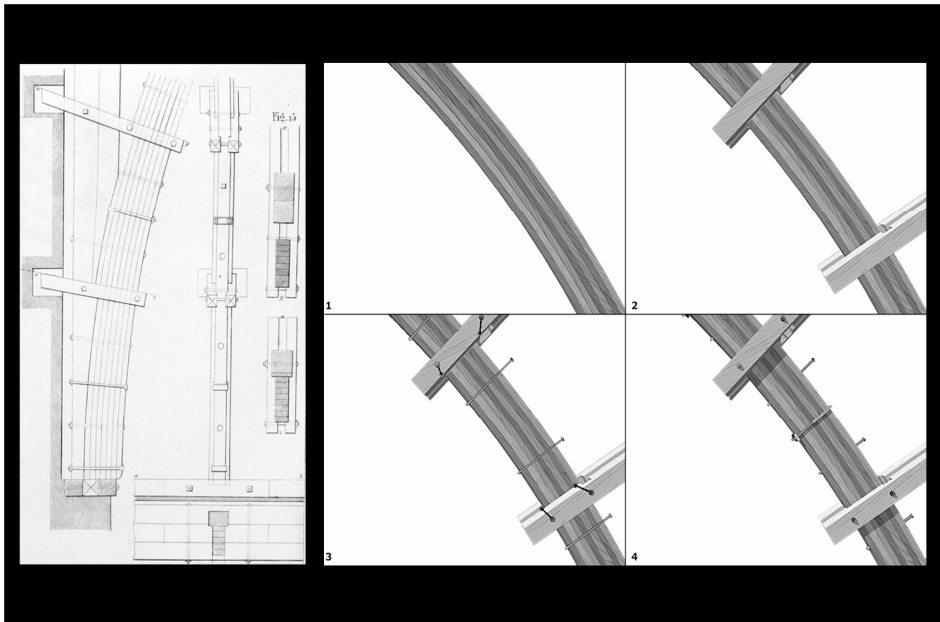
Details: joint on wall (Breymann, 1927, reference plate: 37) and assembling system of arch
